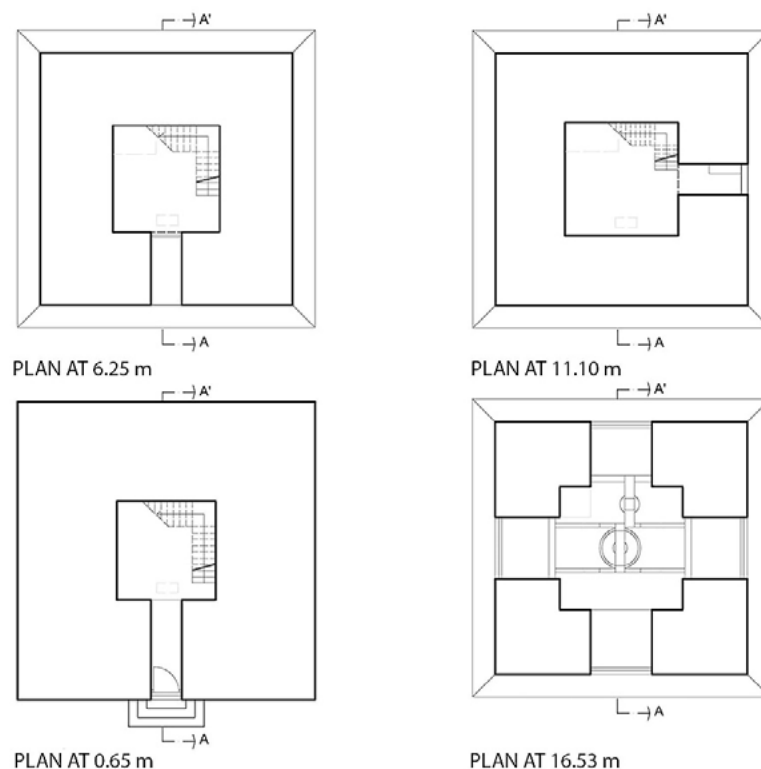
The civic tower of Tora and Piccilli, plans of the fortified building
